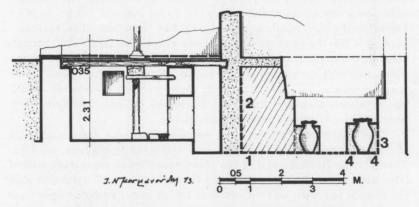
Sector B. Section A-A' of Rooms B1 and B2. Proposed restoration of the roof of B2.
